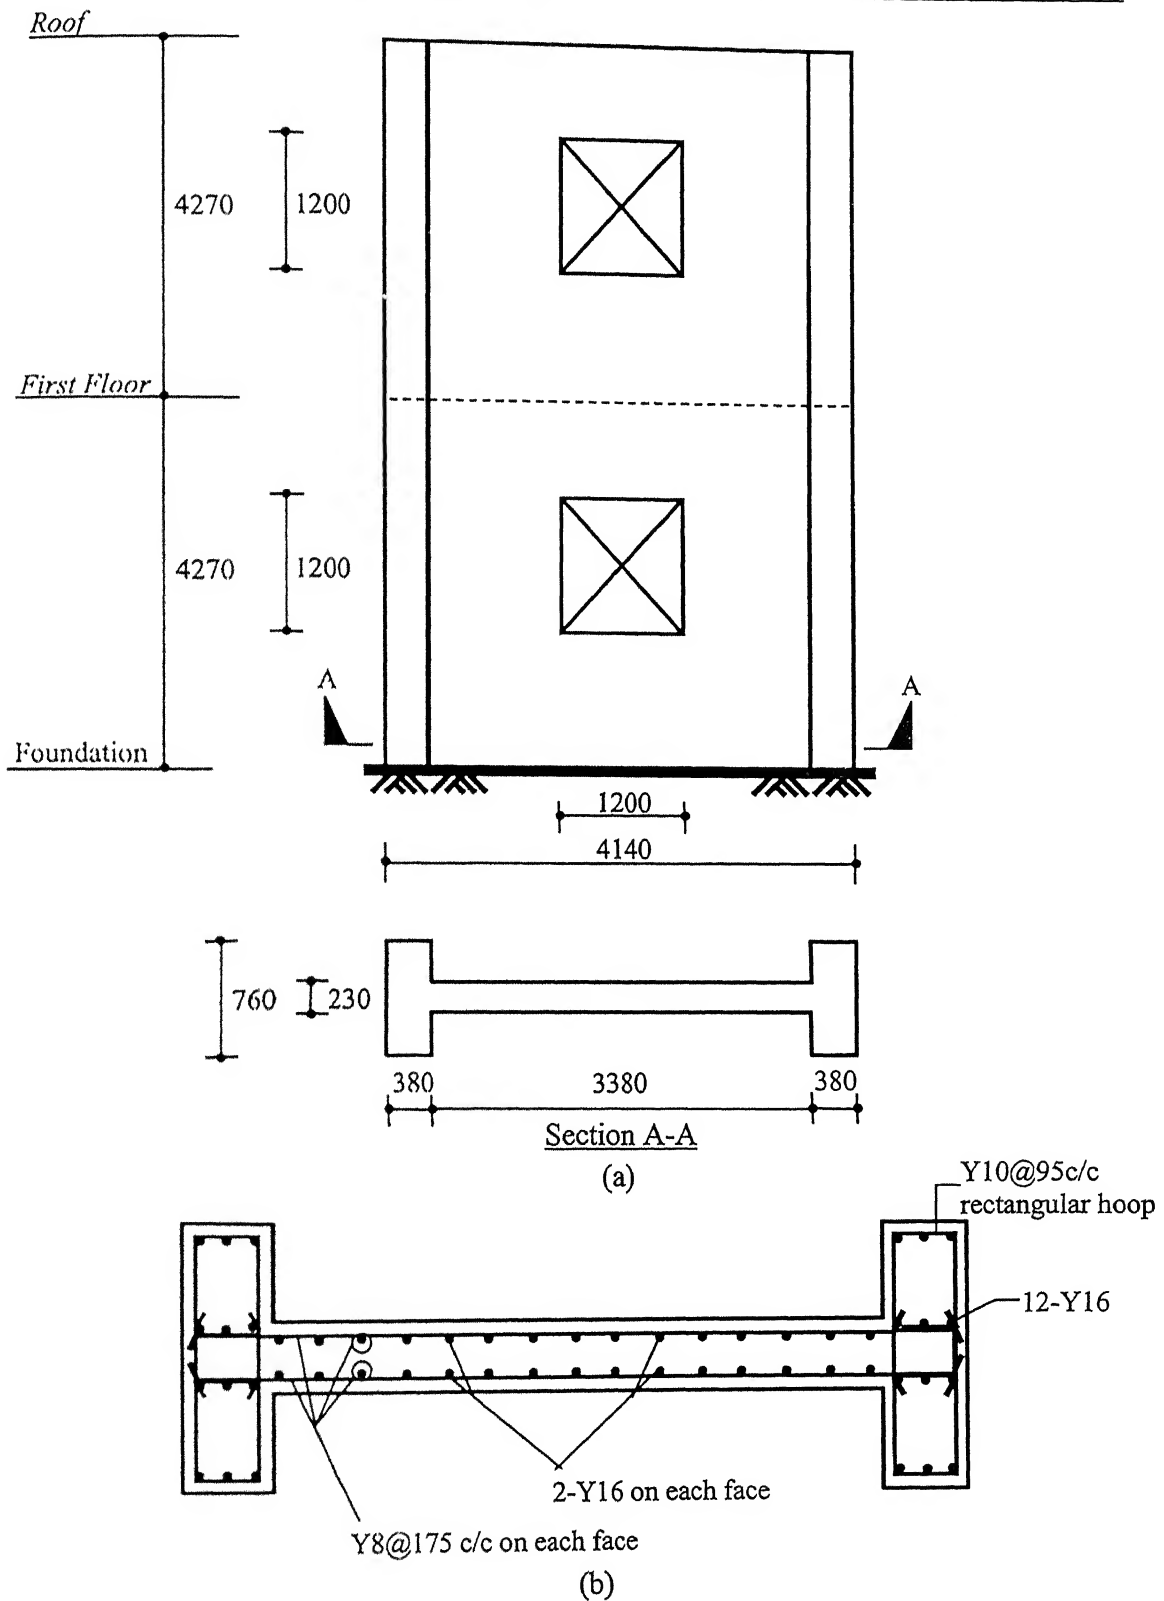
Isolated wall section: (a) elevation and sectional plan, and (b) reinforcement details [Medhekar and Jain, 1993].
